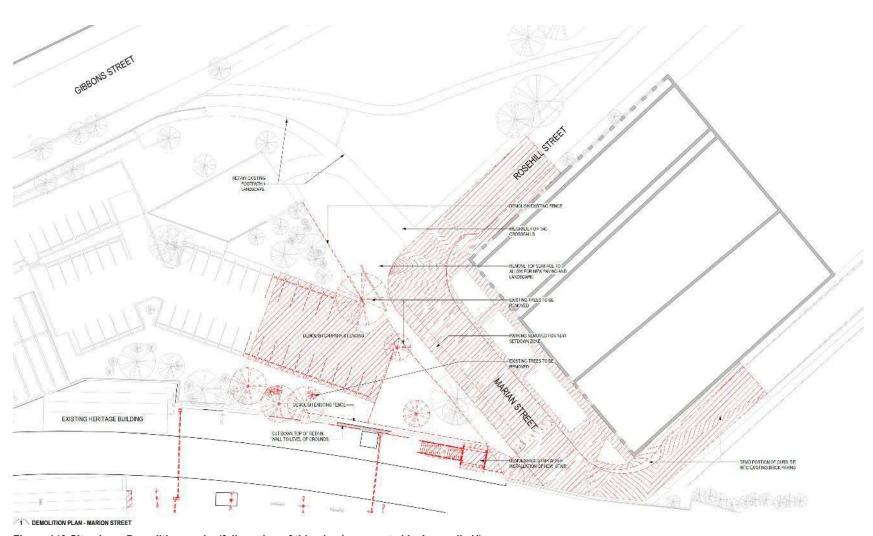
Site plan – Demolition works (full version of this plan is presented in Appendix H)
